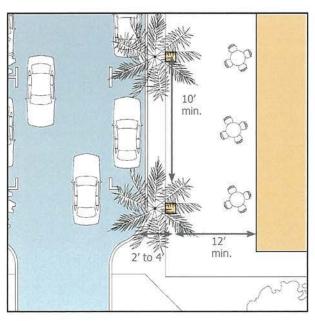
Ground Floor Plan View, Arcade Frontage (Illustrative; roof not shown)
